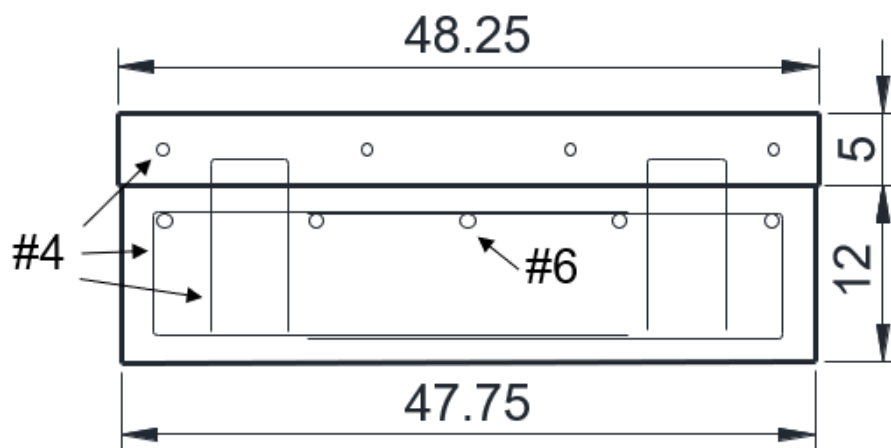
The cross-section geometry and reinforcement detail for 4SB12 and 5-in. deck
